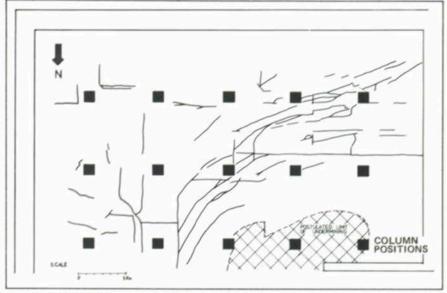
Plan of major fissures in reinforced concrete base slab, underground cistern, Rod El Farag Water Treatment Plant, Cairo
